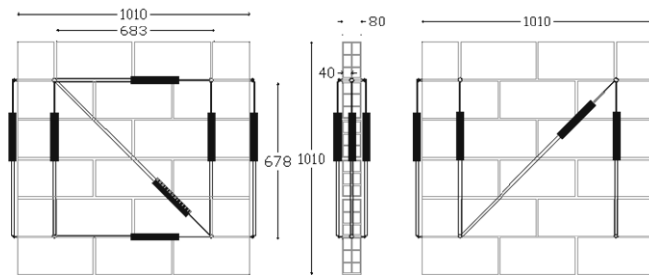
hollow brick panels layout of sensors on the wall compressed orthogonally to holes [mm]
